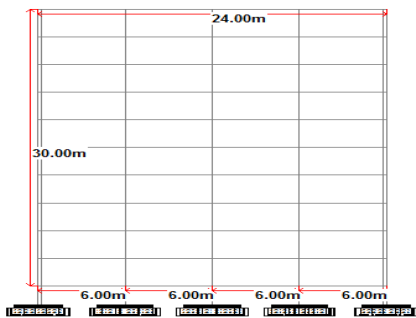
Elevation of the RC framed structure with Isolated Footing
